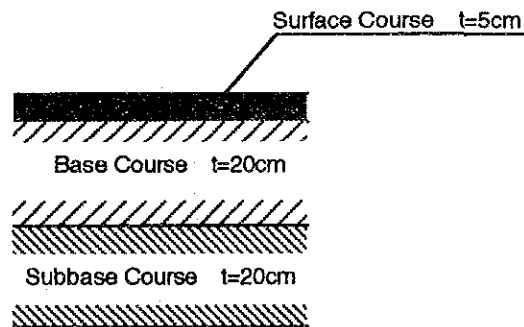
Pavement Structure of Terminal Road and Carpark
